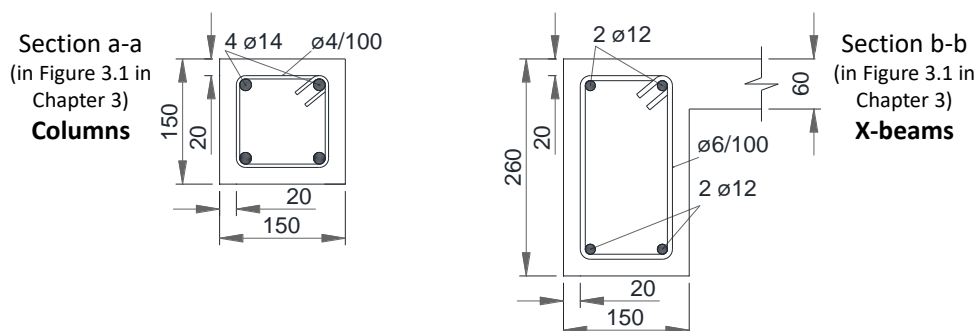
Cross-section dimensions and reinforcement layout of columns and beams in x-direction
